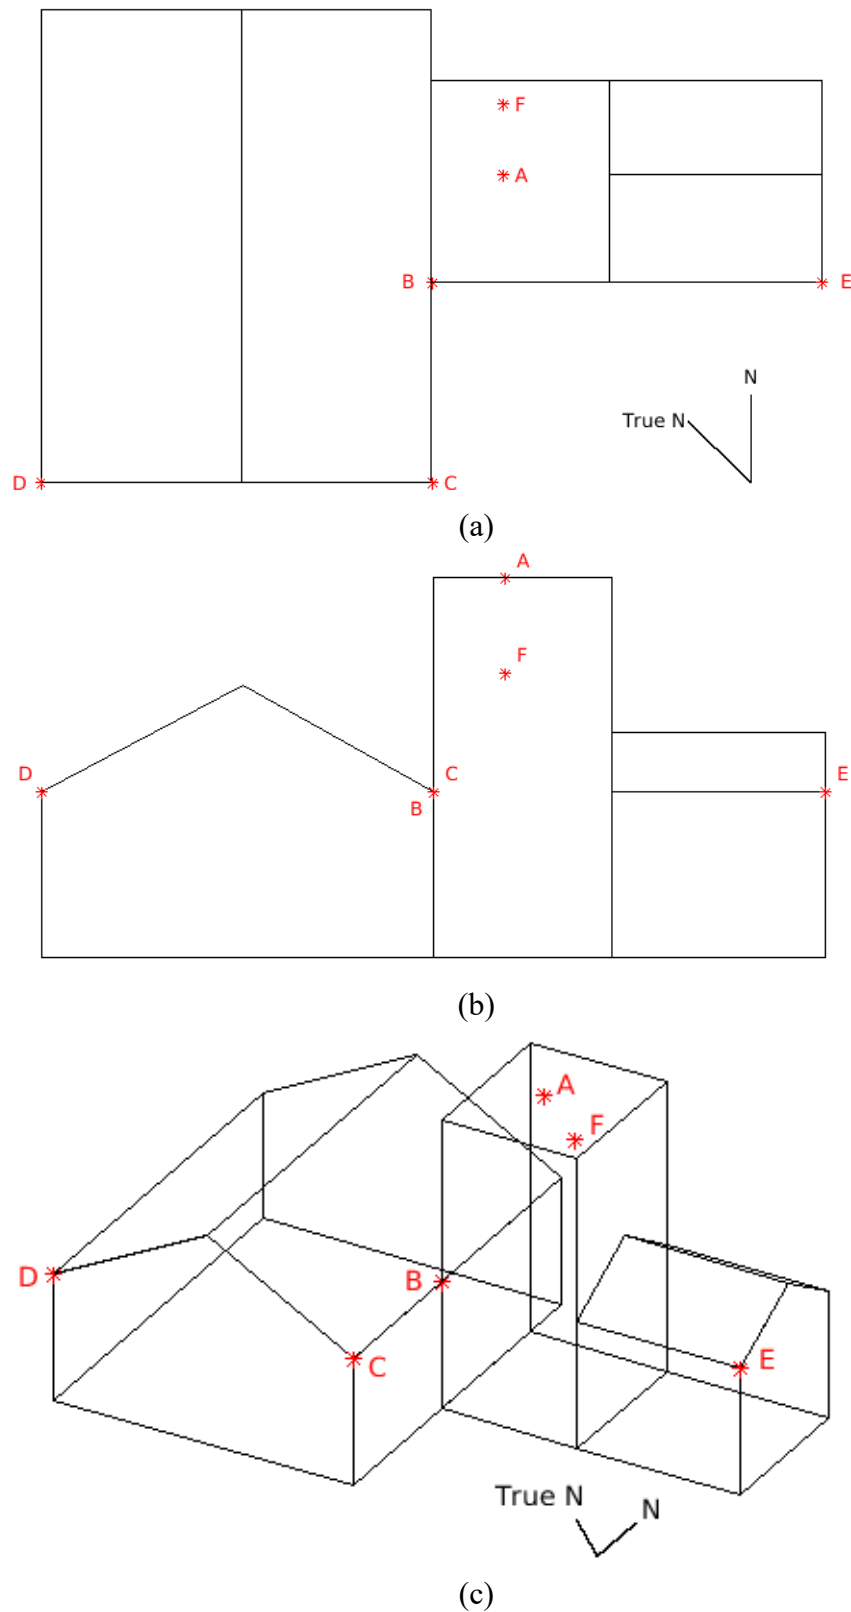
Accelerometer Locations in (a) Plan, (b) South Elevation, and (c) Isometric View
